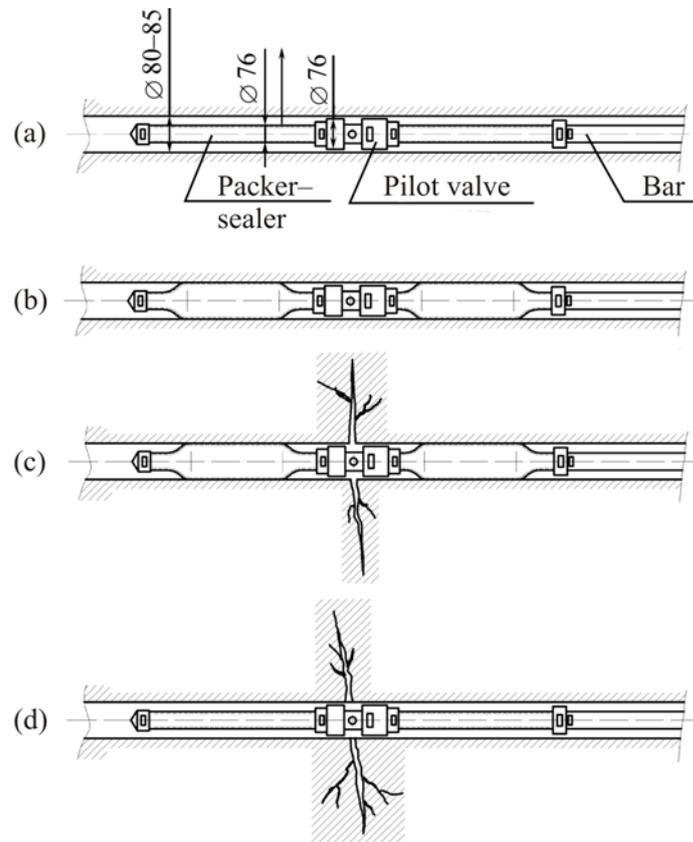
Process chart of multistage hydraulic fracturing of coal: (a) inlet of packer in hole; (b) sealing of hole; (c) hydraulic fracturing of coal; (d) unsealing of hole and advance of packer.
